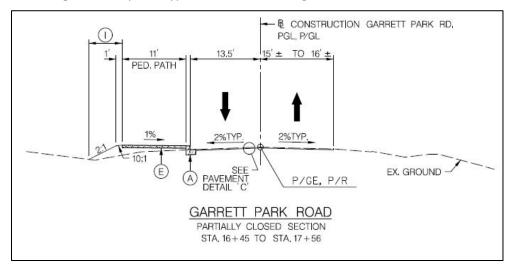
Proposed Typical Cross Section Design – Stations 16+45 to 17+56
